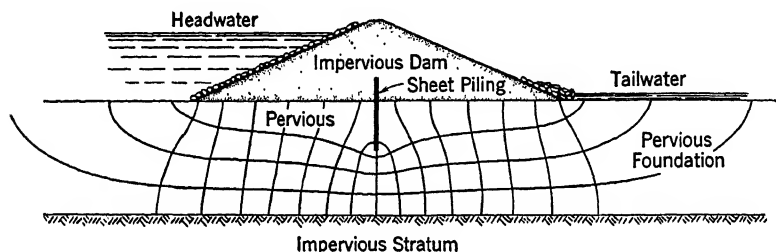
Flow net for pervious foundation of impervious dam with steel sheet piling which does not completely penetrate pervious foundation.
